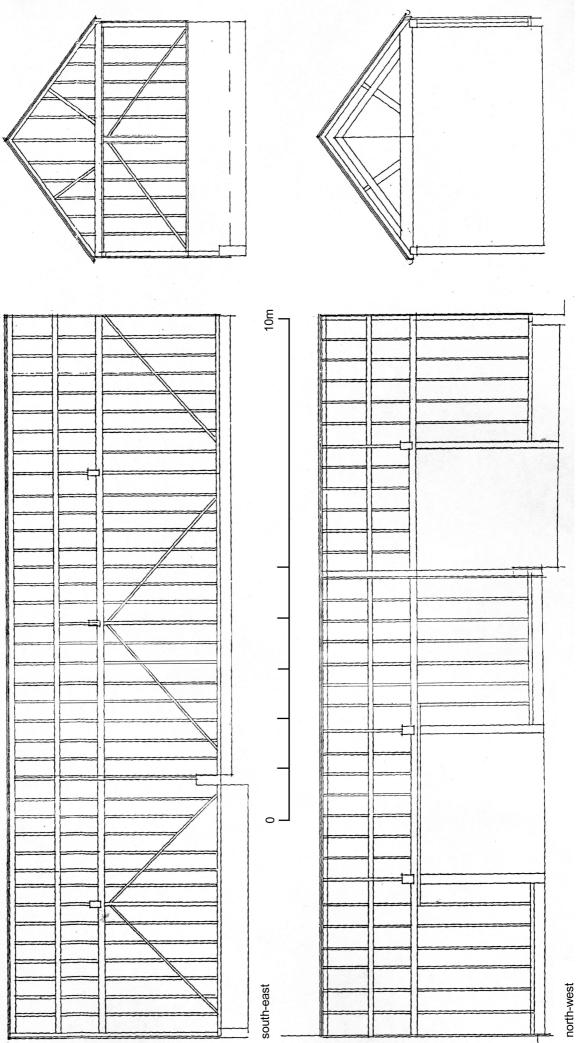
Building (D) attached to barn (E): internal elevations - of south-east side and north-west side, and cross-sections.
